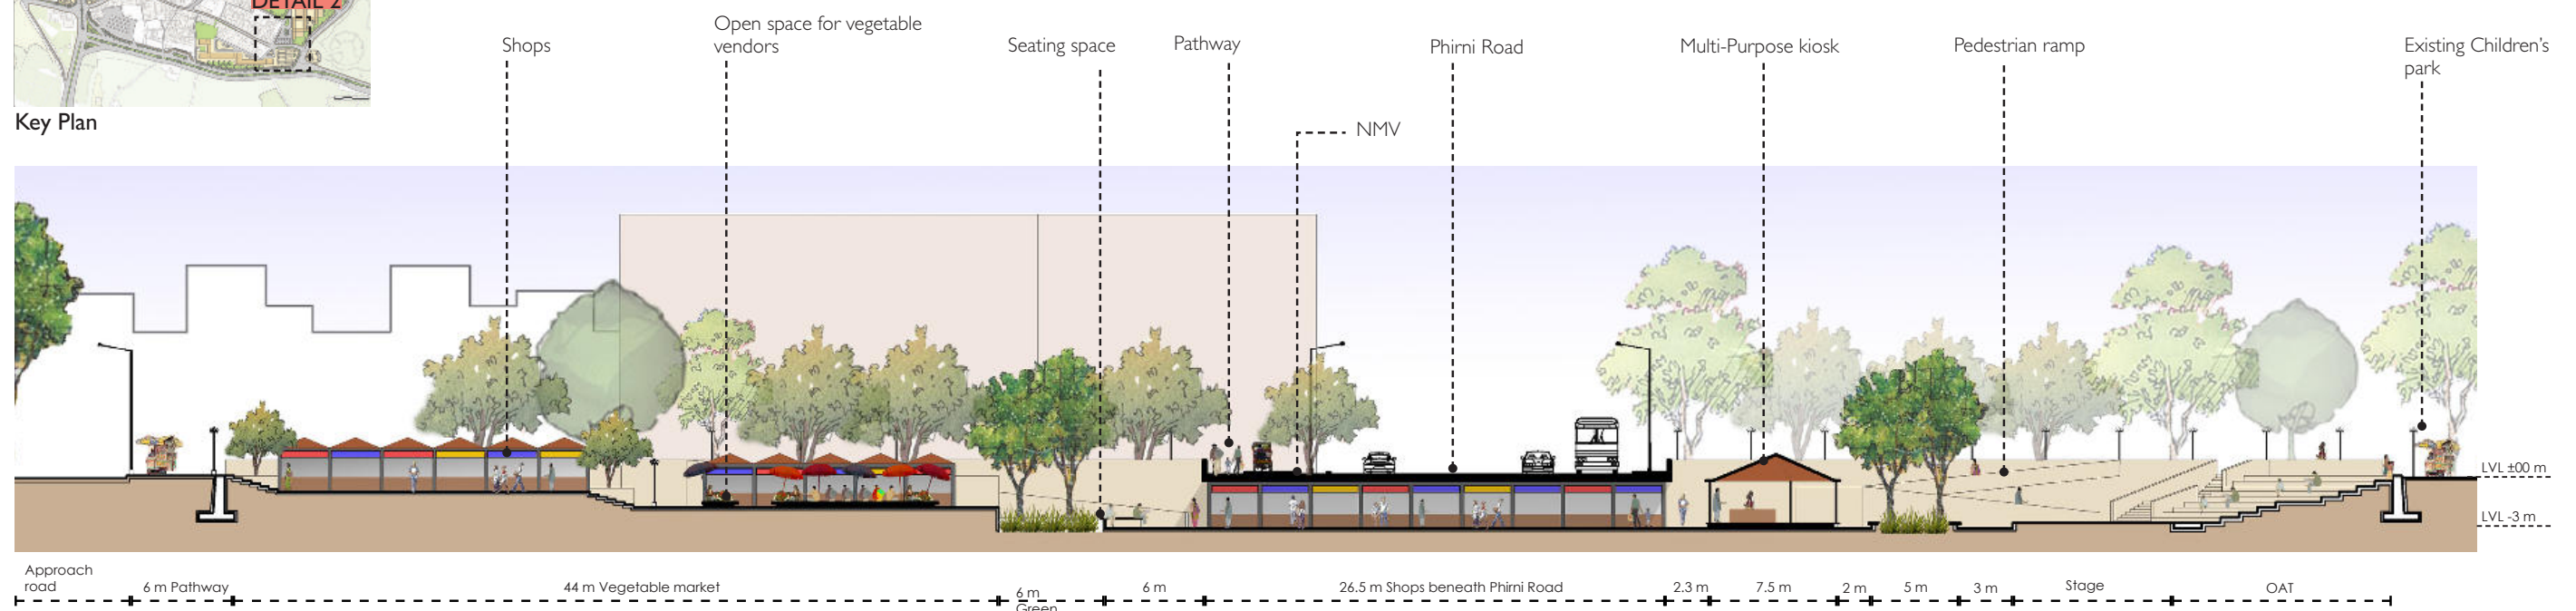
Underpass Connecting Children's Park along with Vegetable Market
